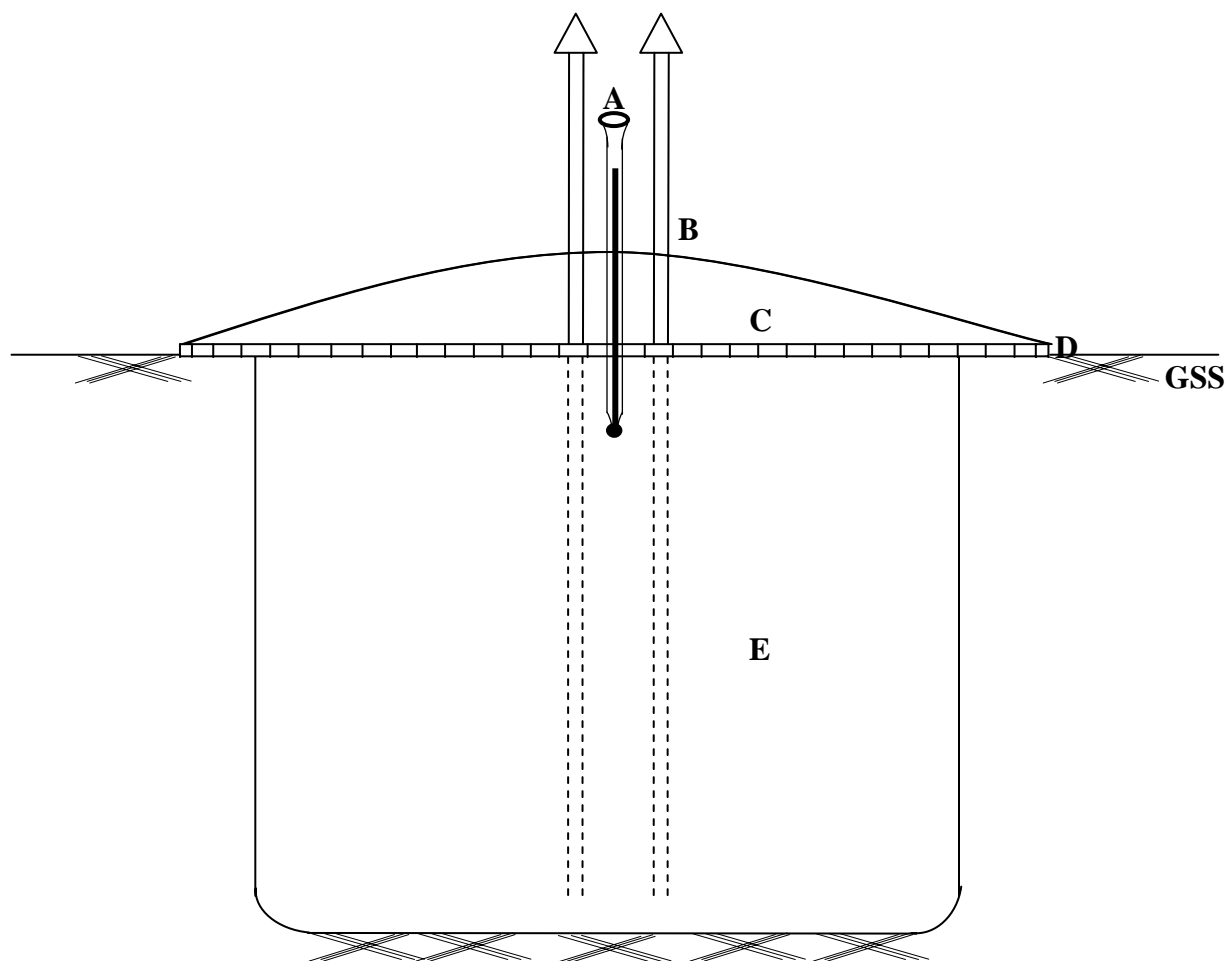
A Schematic Diagram of the Underground Pit Storage Structure.
